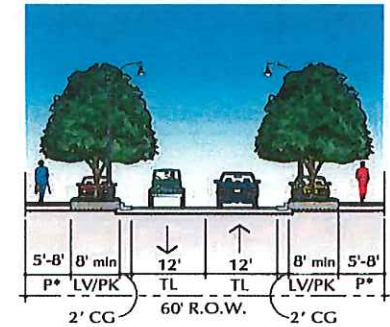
B (4) Local Urban Type 3 Roadway with On-Street Parking
